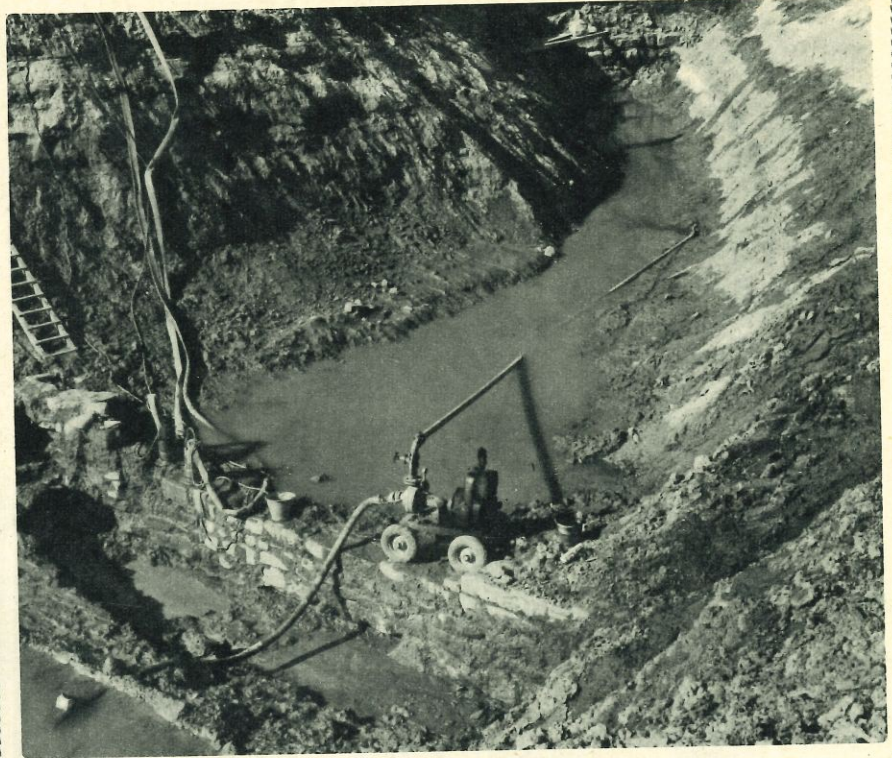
ELECTRIC AND PETROL DRIVEN PUMPS HOLDING THE WATER AT THE SIX METRE LEVEL ON THE INNER FACE OF A 4TH-CENTURY GREEK WALL.
